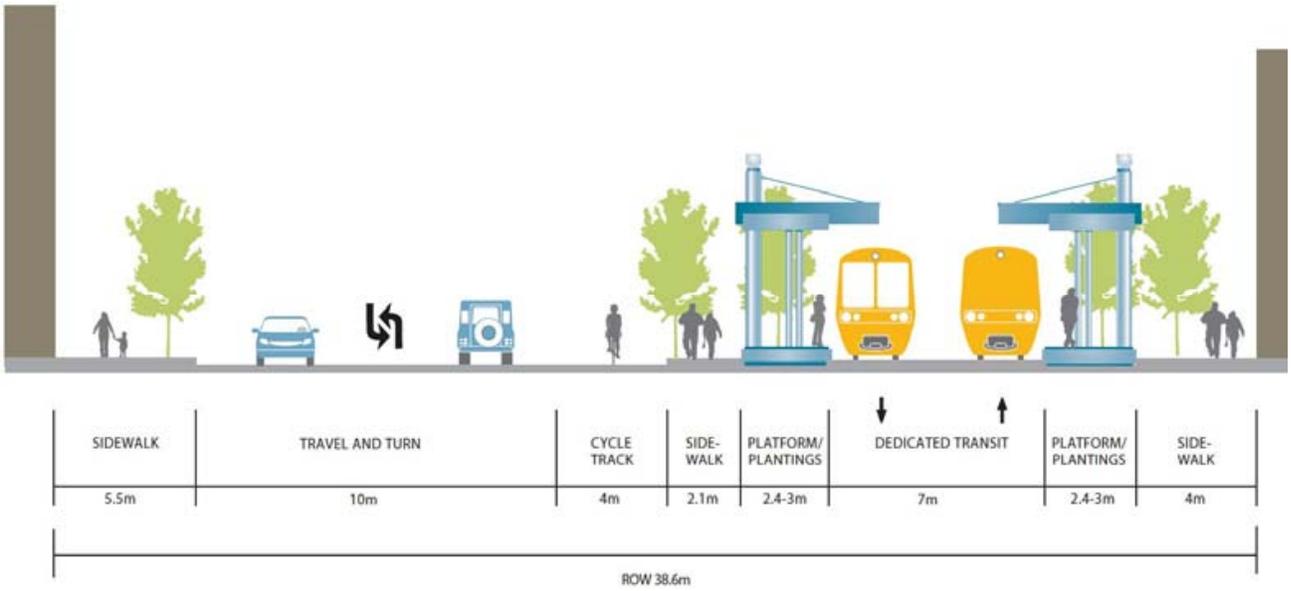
Cross-section for Cherry Street between Lake Shore Boulevard and Villiers Street (north of Commissioners Street, facing north) Proposed R.O.W.'s provided by City Planning April 2014
